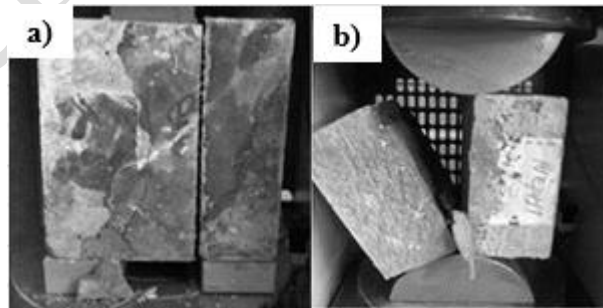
The shear and tensile failure of the specimens: (a) epoxy-contained specimen; (b) HEMC-contained specimen.
